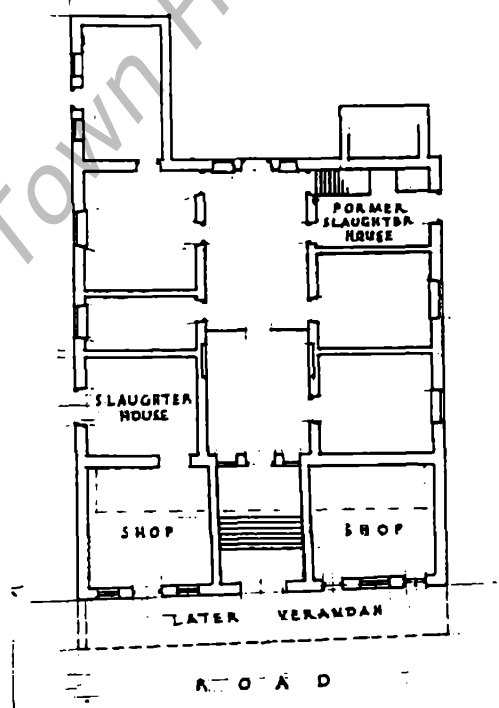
^b PLAN SHOWING ALTERATIONS IN 1824.
